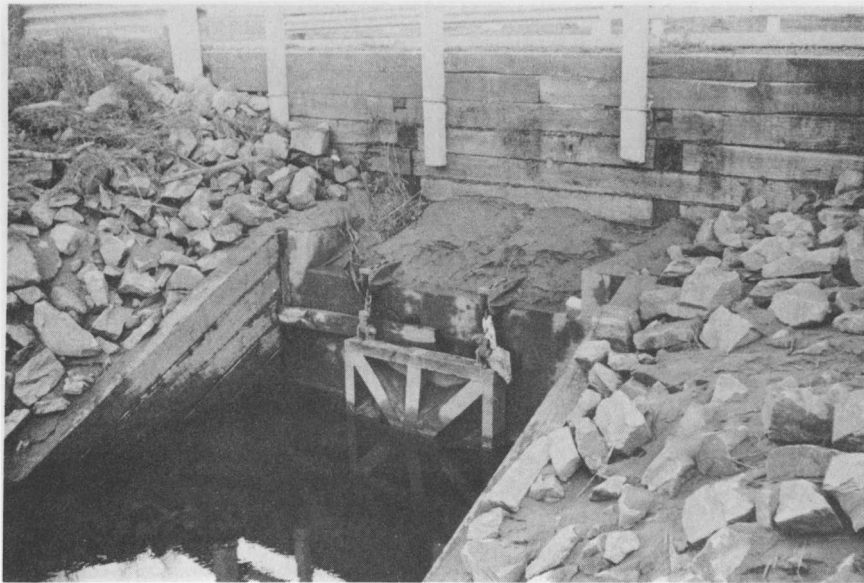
Shubenacadie Marsh, Hants County, N.S. – This structure was originally a large timber highway culvert. It was modified by threading a pipe through it, pouring a concrete headwall at the downstream end, and installing a steel gate over the opening.
